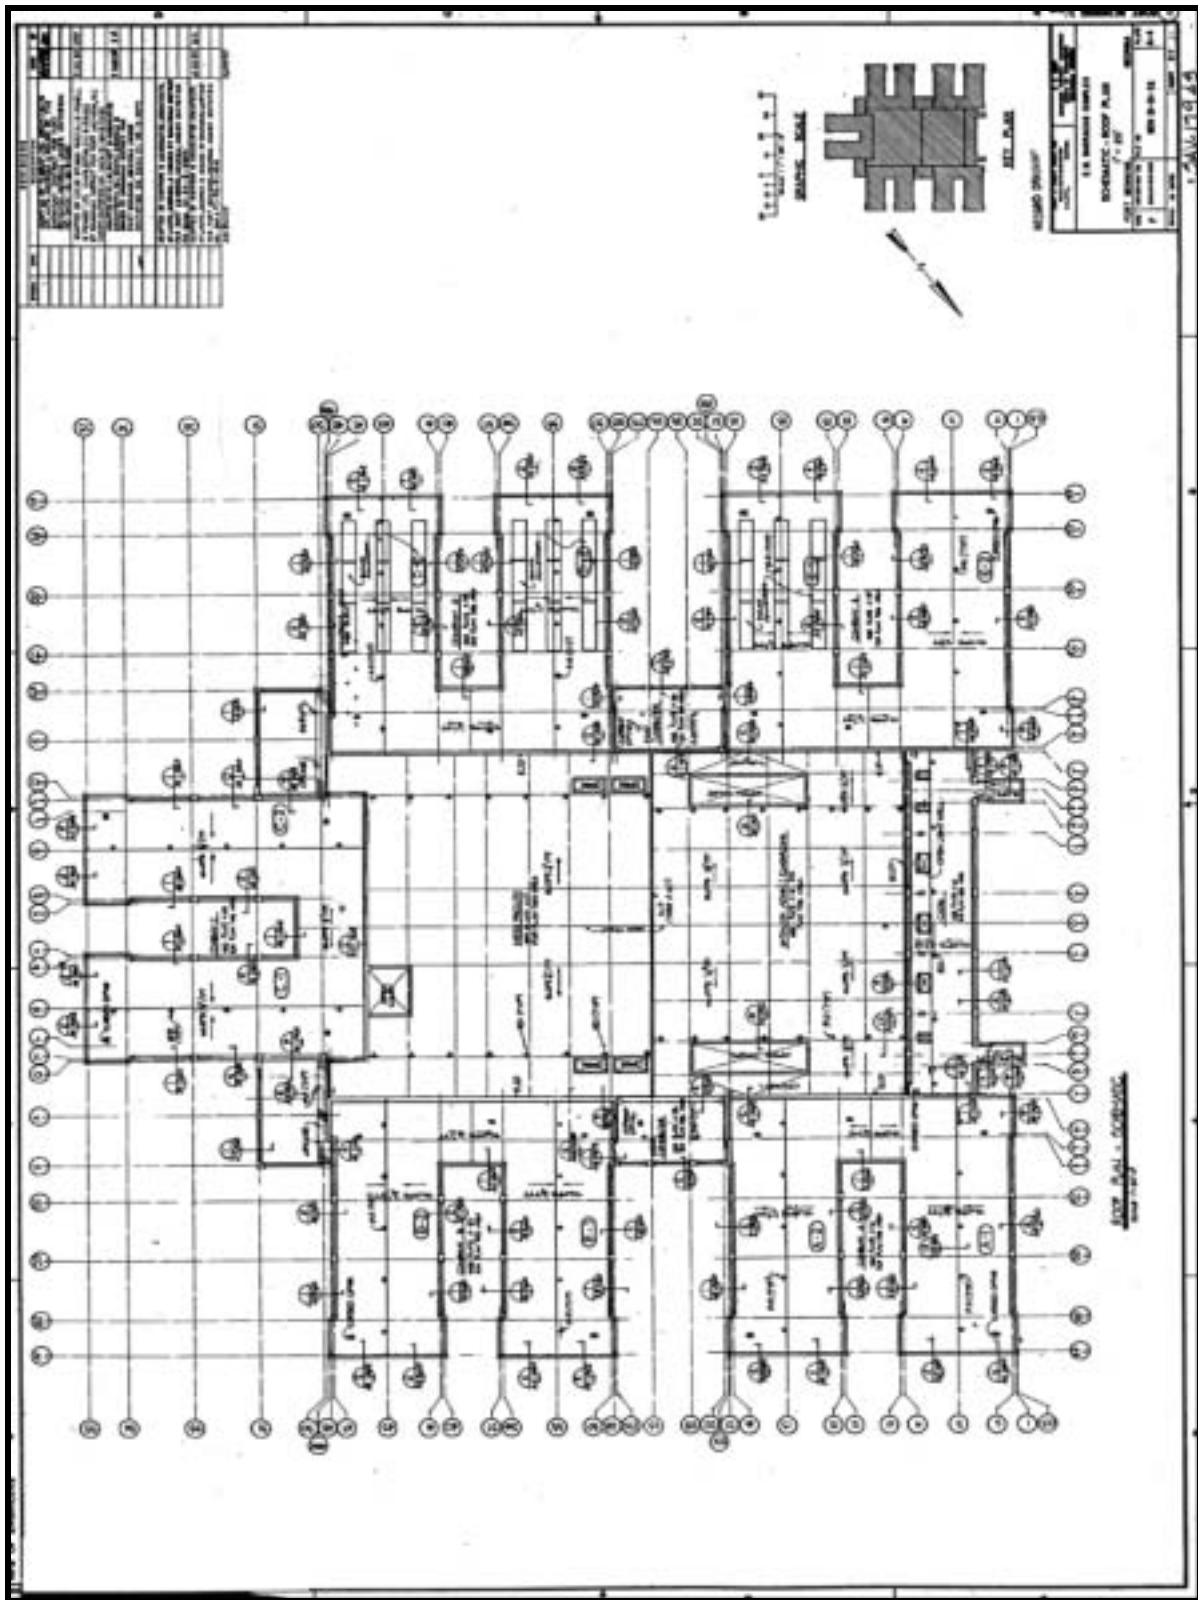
Starship barracks, roof plan (ca. 1974, revised 1985) (Engineering, Ft. Benning).
